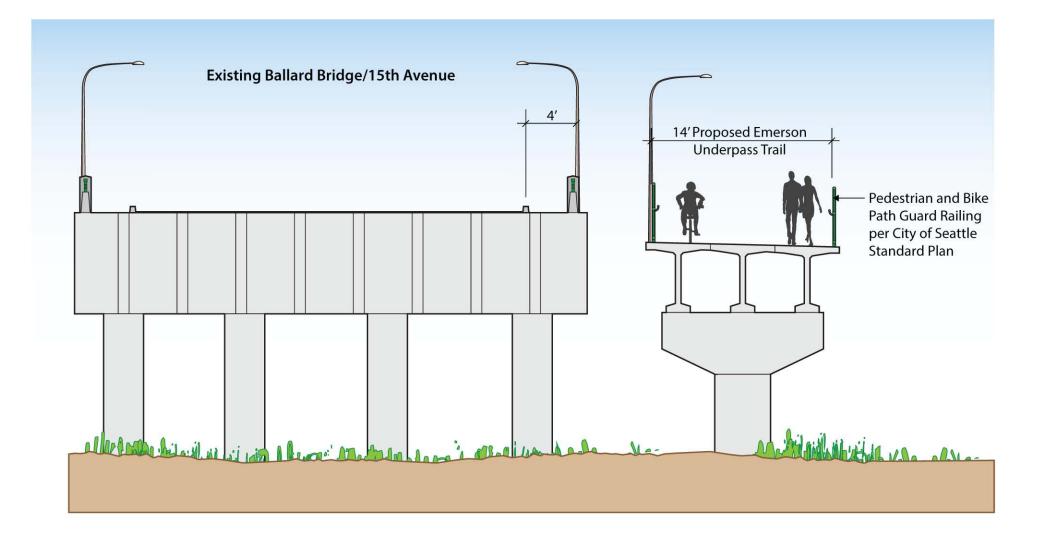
Emerson Underpass Trail - Section 2 (STA 14+00/17+50)
